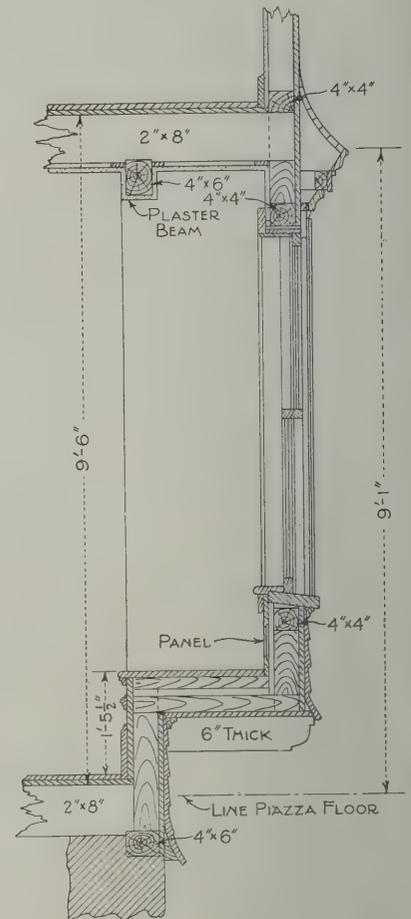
Section Through Living Room Bay—Scale 1/8 in. to the Foot
